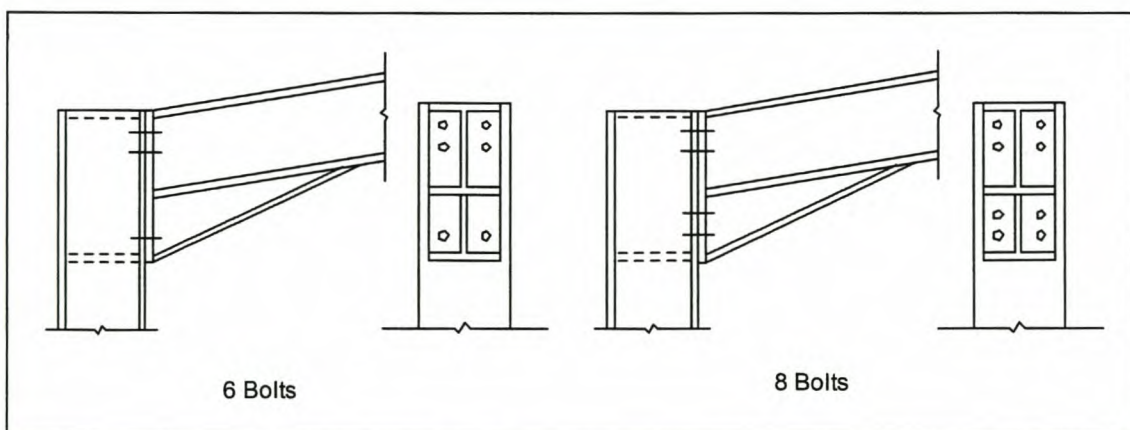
Design alternatives for haunched flush end plate beam column connections
